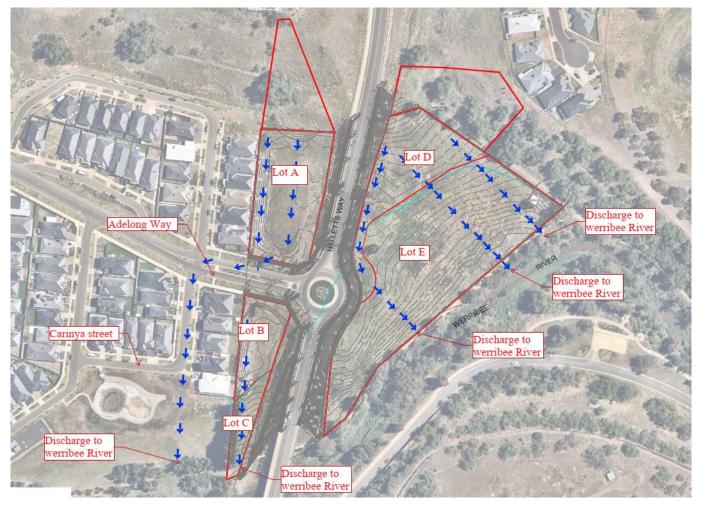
INDICATIVE OVERLAND FLOW PATH LAYOUT PLAN
